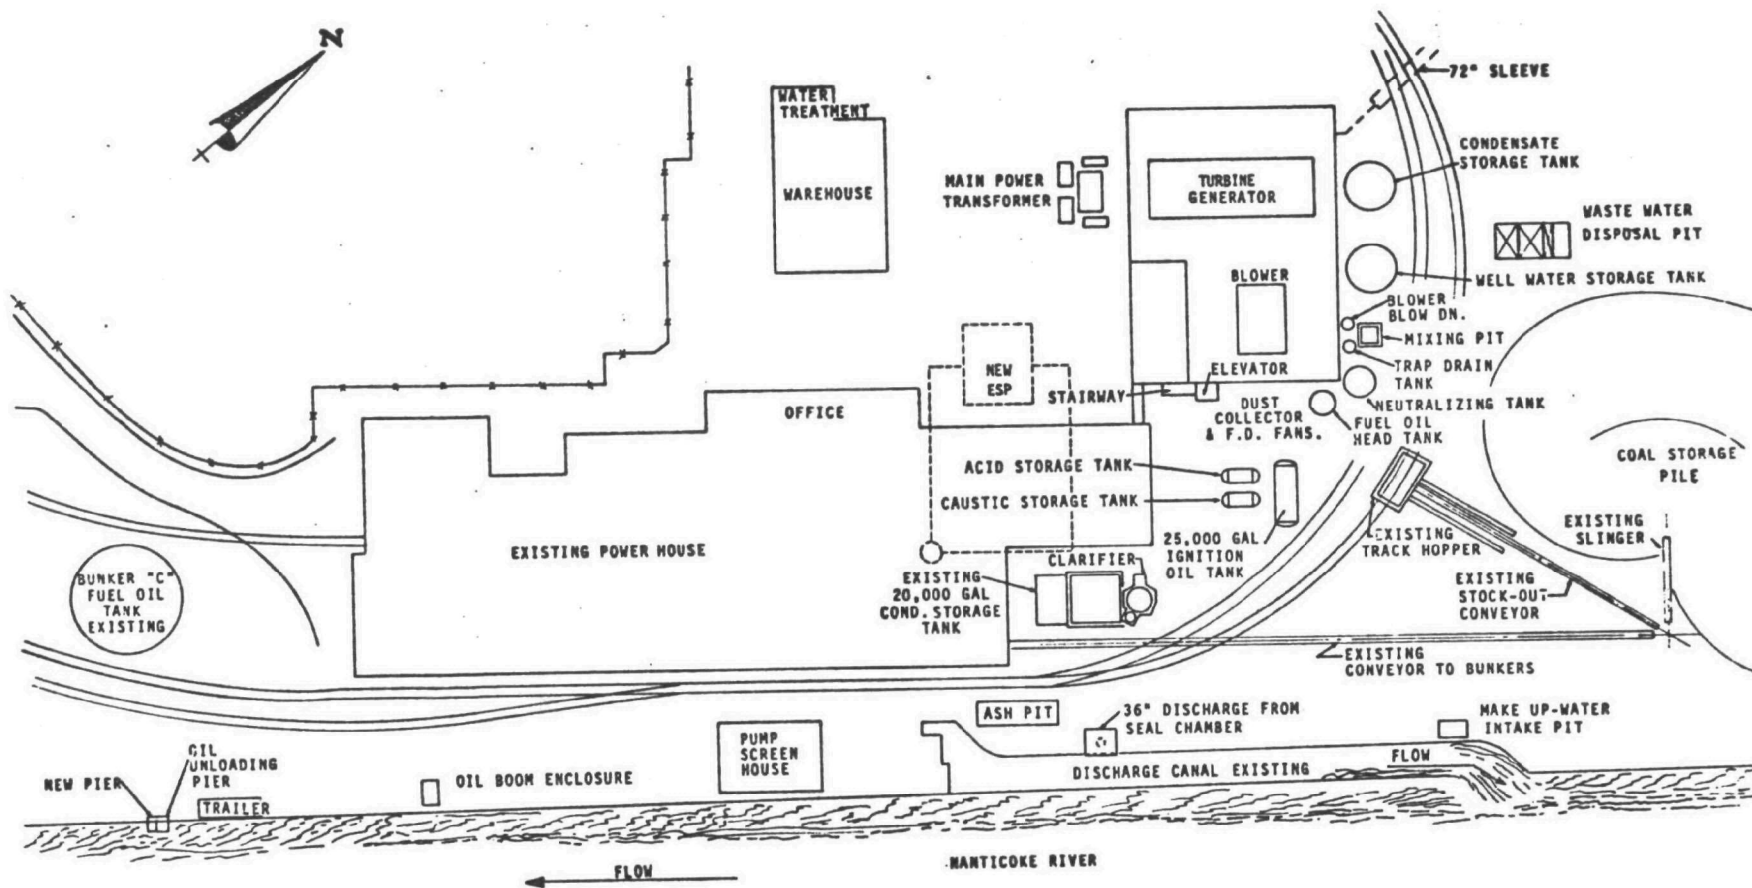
Site plan showing possible location of a new ESP for Boiler 7 at the Vienna power plant.
